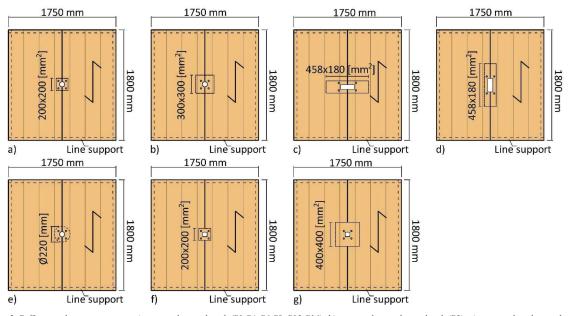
Different column geometries: a) square plate with stub (S1-S4, S6-S9, S15-S16); b) square plate with wood stub (S5); c) rectangular plate with wood stub (S10); d) rectangular plate with wood stub (S11); e) round column (S12); f) square plate and HSS (S13); and g) square plate and HSS (S14)
